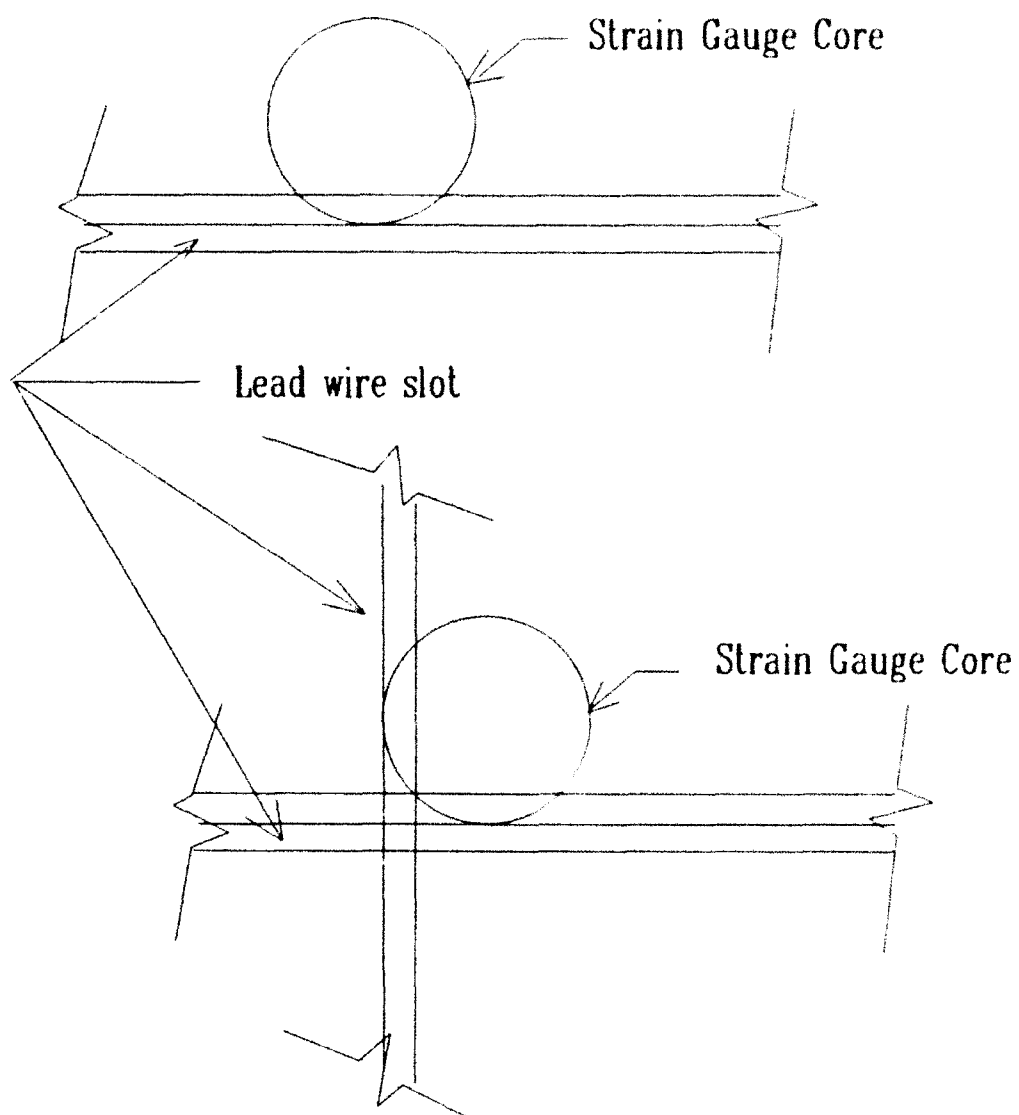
Plan View of Lead Wire Slots Bisecting Core Holes
